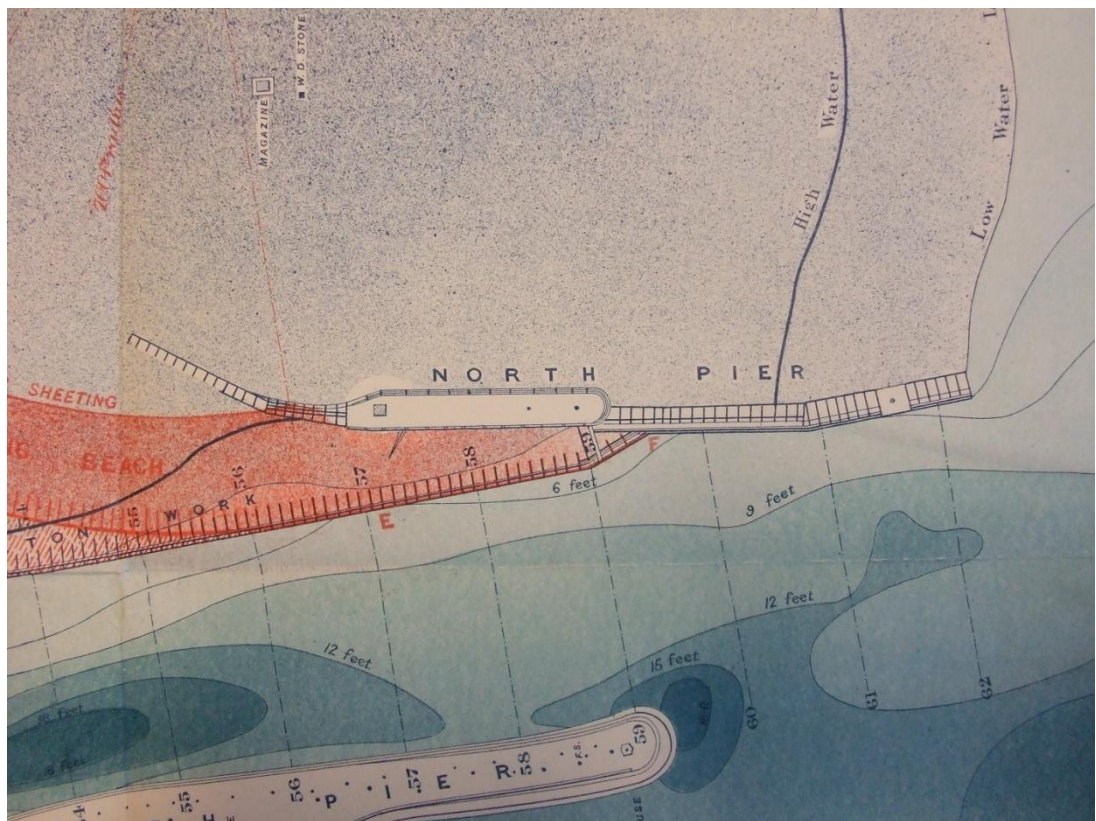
, Plan of Great Yarmouth north pier by John Coode, 1885, showing lateral divisions within (NRO Y/PH 120c)
